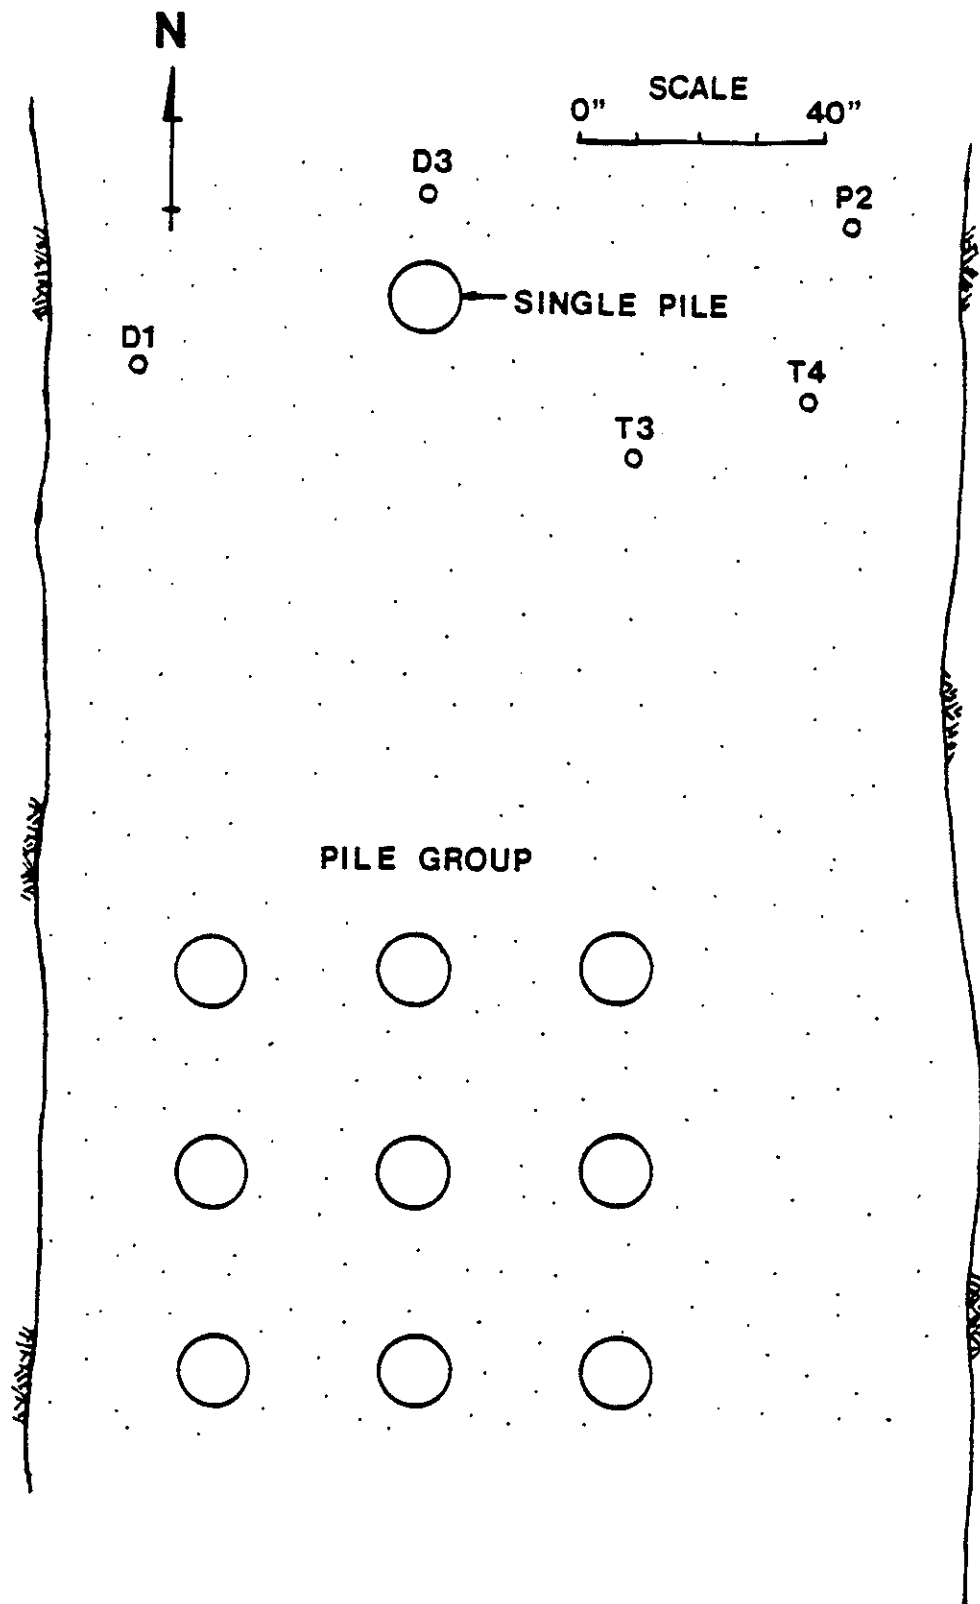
Pressuremeter Tests in The University of Houston Foundation Test Facility Sand Site.
